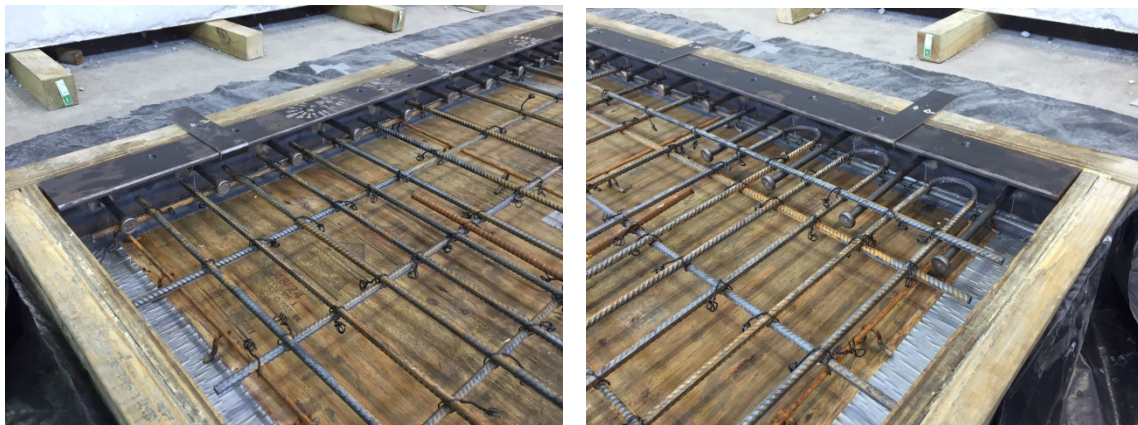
Detail of Corner Reinforcing in PCP for Test 7 at the North-West (left) and North- East (right) Corners
